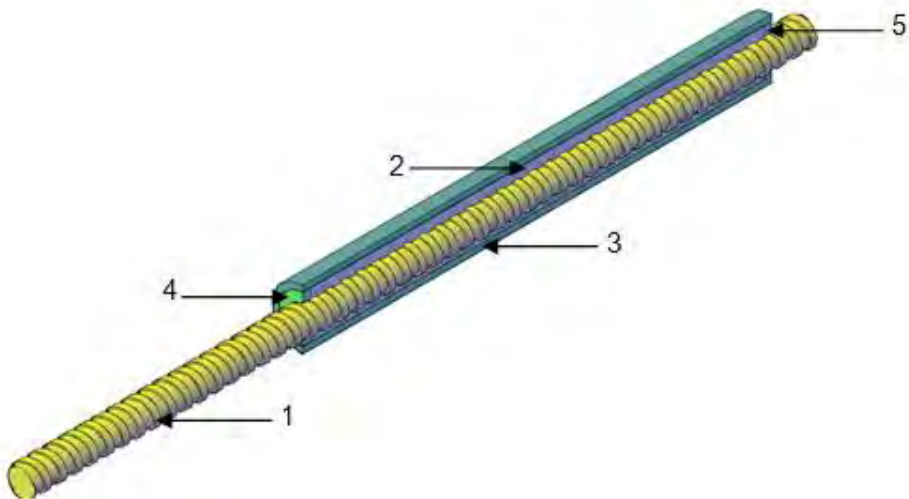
Test specimen description: 1 – GFRP reinforcing bar; 2 – adhesive; 3 – steel tube; 4 – steel cap; 5 – PVC cap
